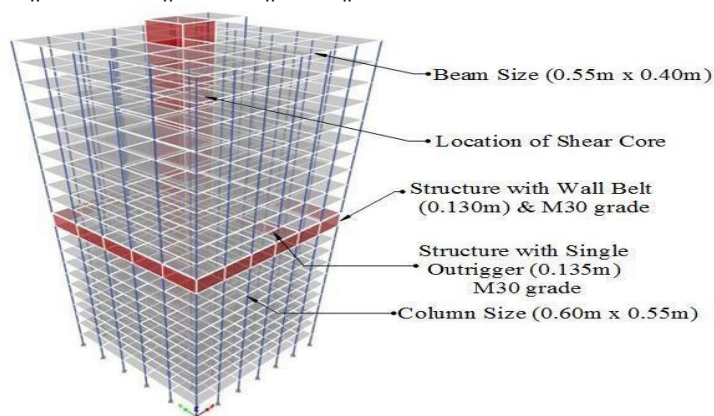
Case OTS5: Single Outrigger and Wall Belt Supported System at E1 with Dual Core
